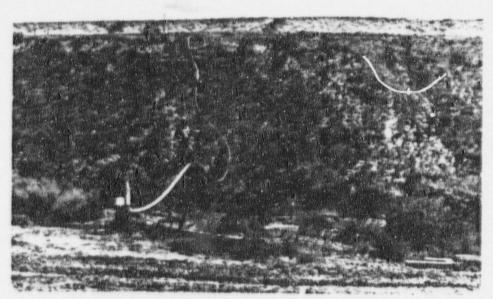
VIEW OF SEEPAGE COLLECTION PUMP AND LINE UP EMBANKMENT INTO RESERVOIR.
